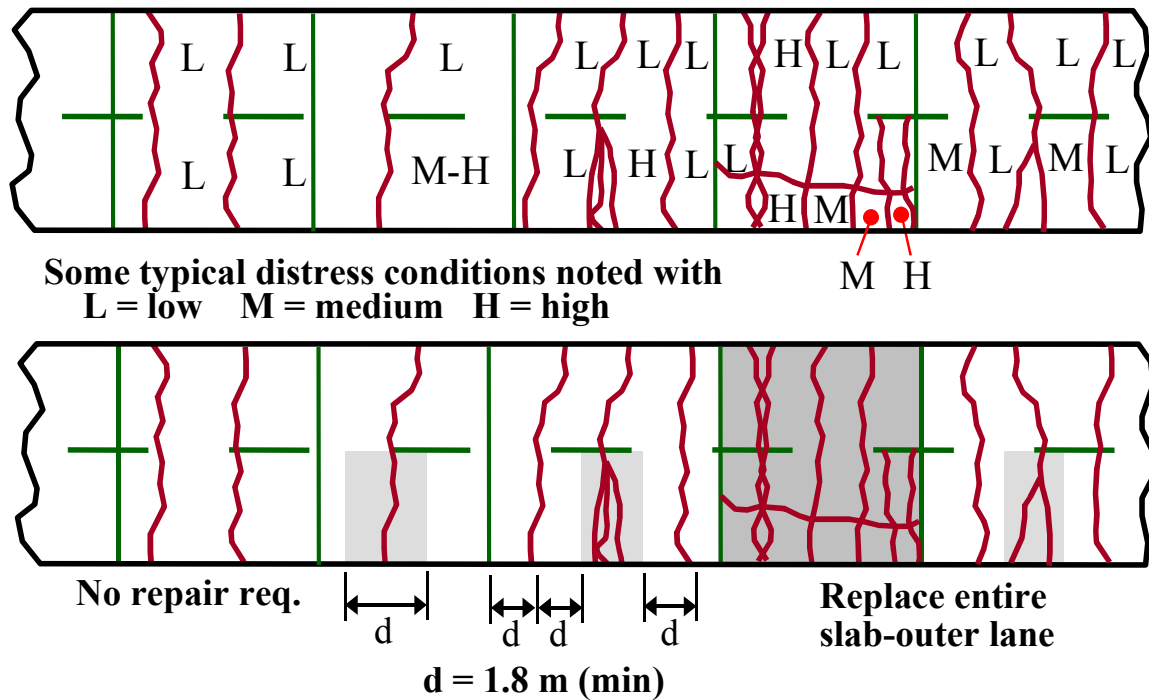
Selection of full-depth repair boundaries for continuously reinforced concrete pavement.⁴
